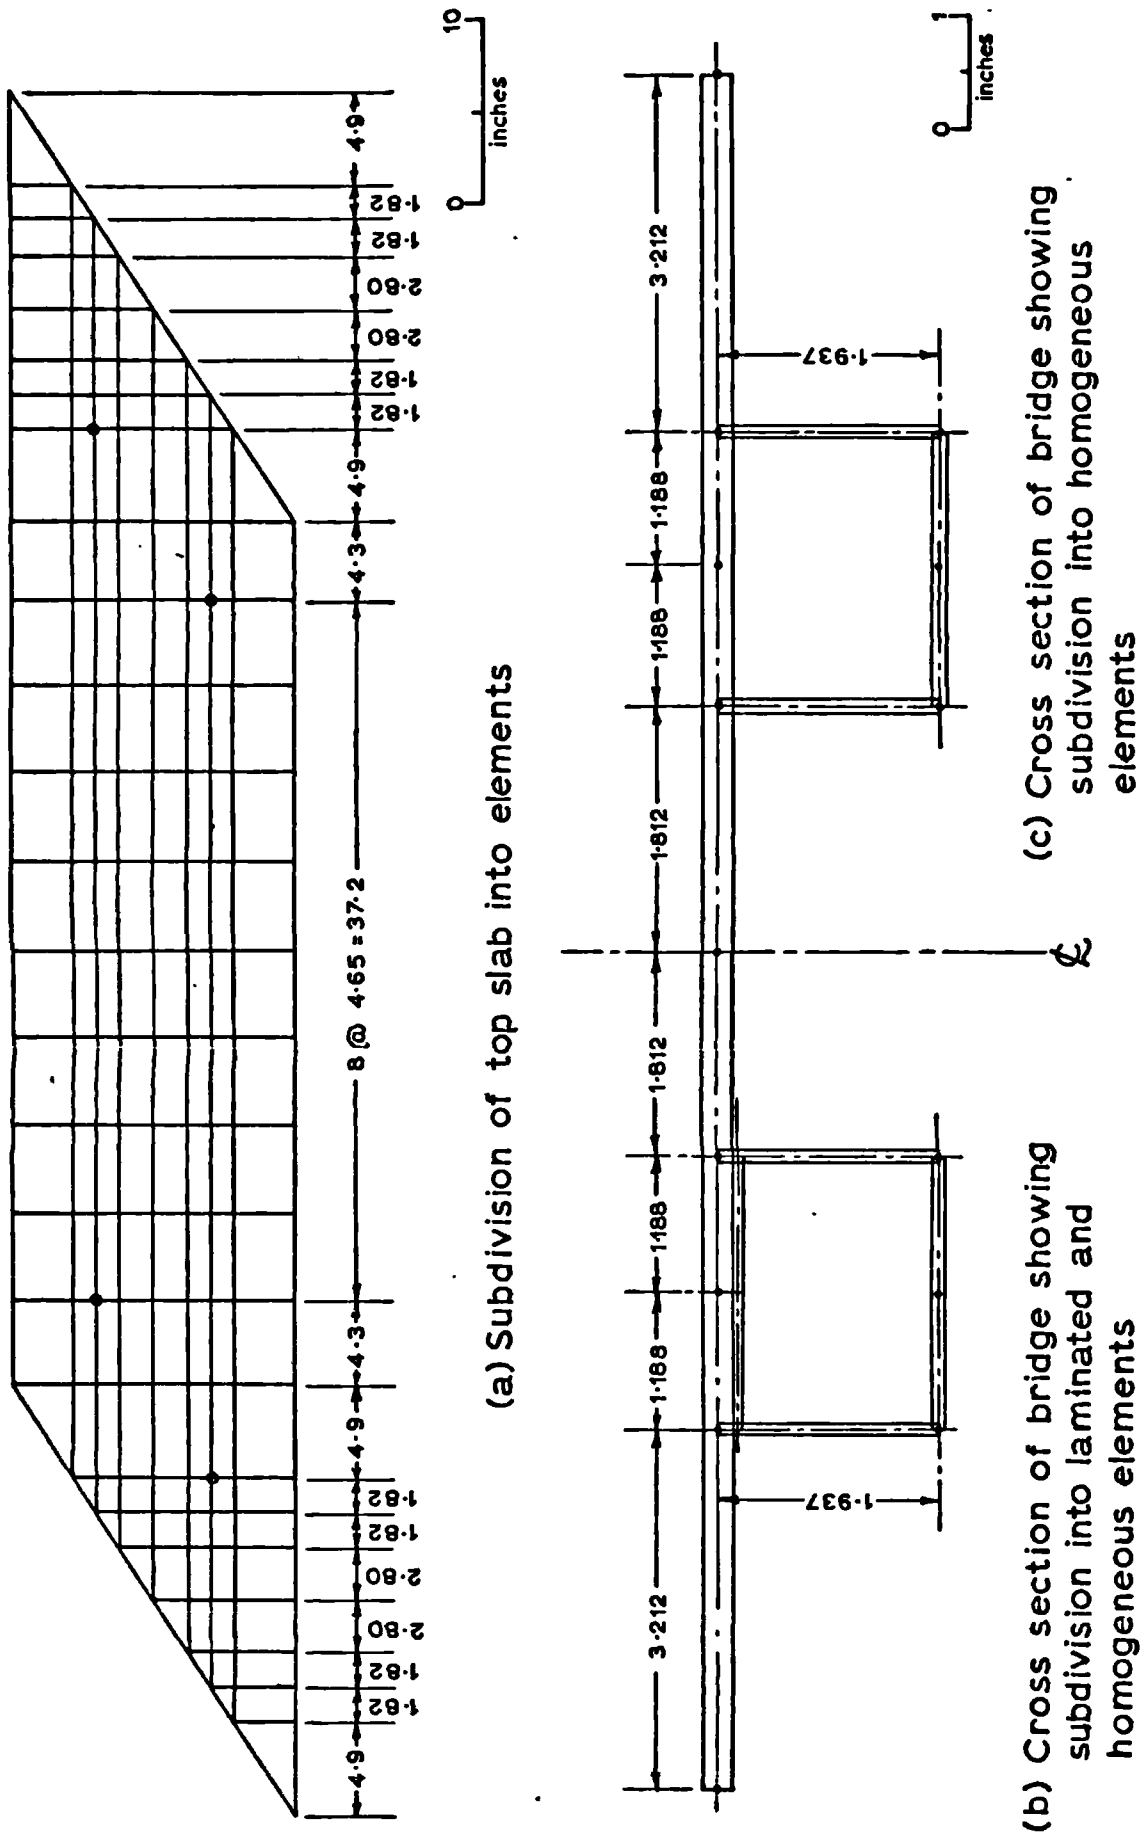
Skewed composite twin cell box girder bridge model.
